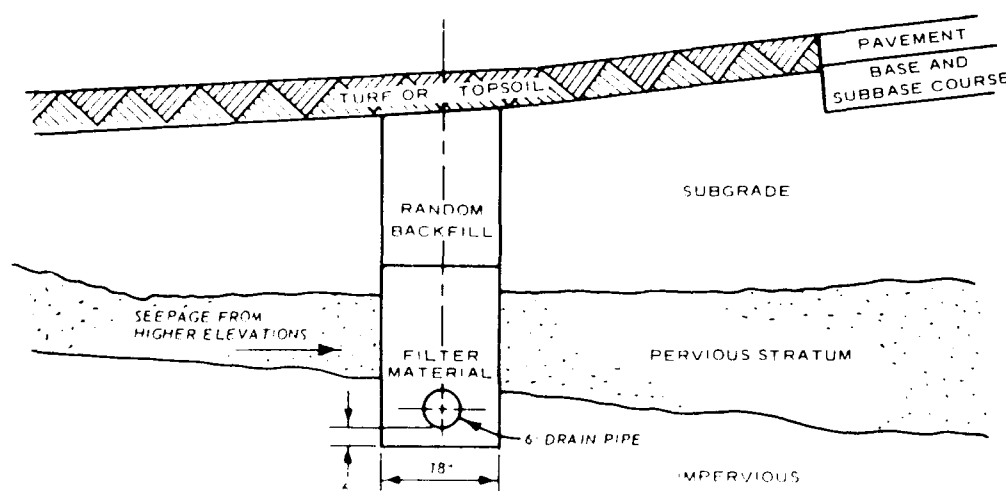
Typical intercepting drain (from U.S. Army 1979).
